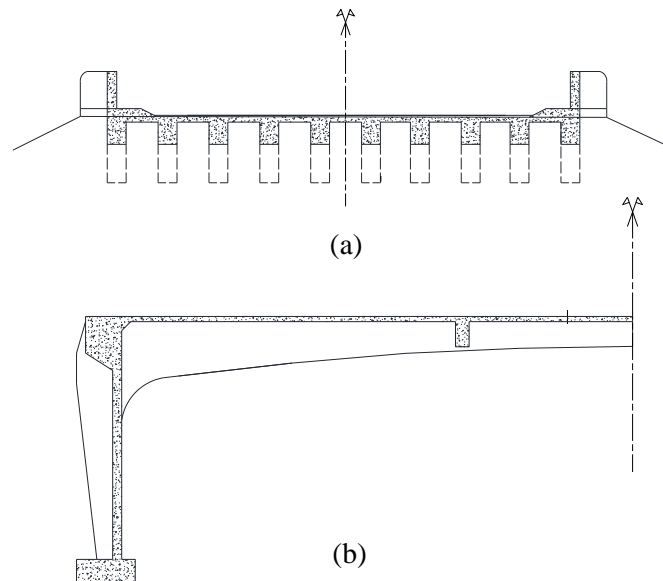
Case study structure (a) Cross section, and (b) Elevation.
